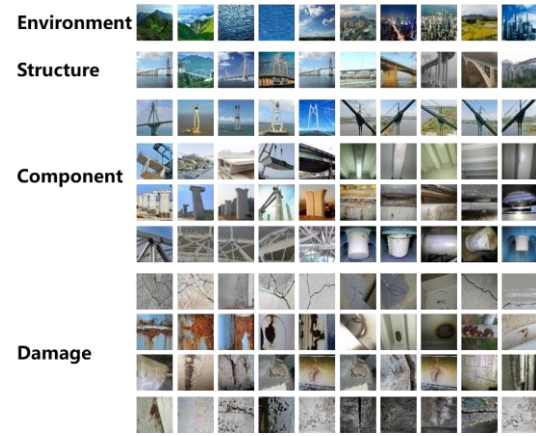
Representative images of hierarchical structural damage with multi-scale information for cable-supported and concrete bridges.
